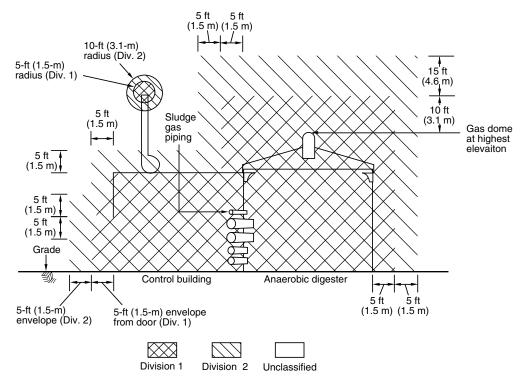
(c) Anaerobic digester control building containing sludge gas piping and with ventilation C; illustration of Table 4-2(a), row 16c.
